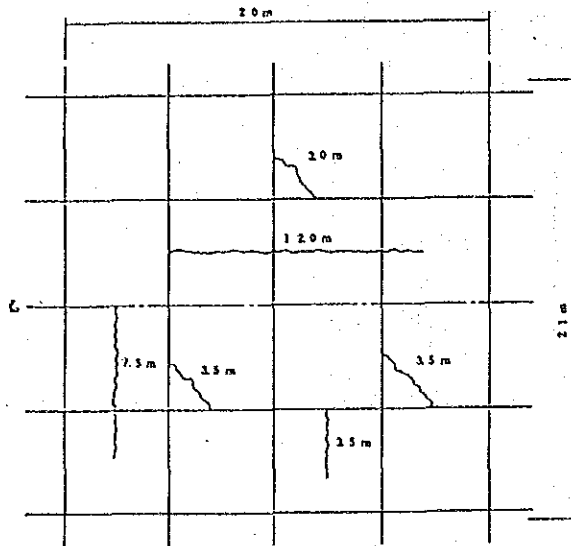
Sample of Crack Measurement on Rigid Pavement
